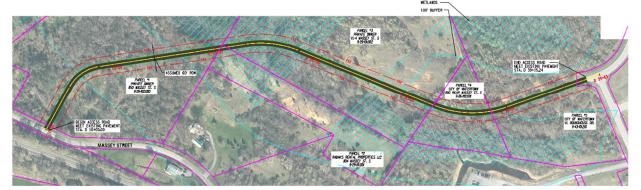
Alternative 7 – Access Road from Roundhouse Drive to S. Massey Street
